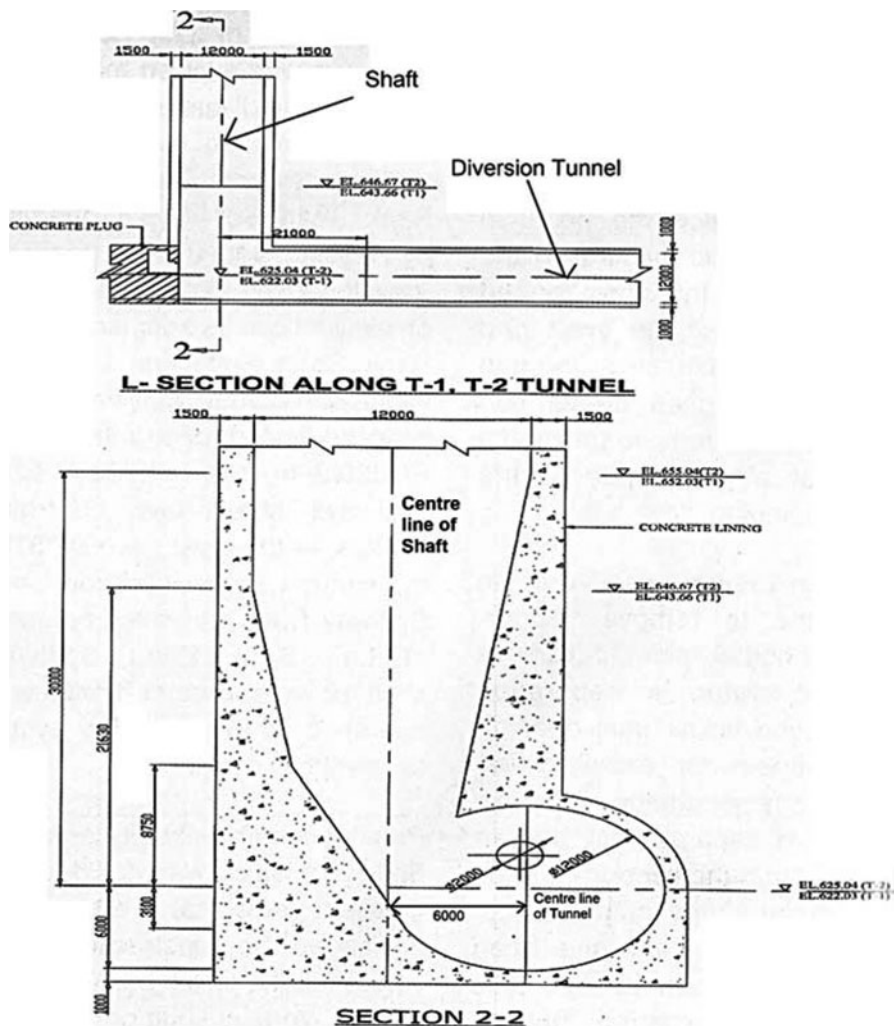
Swirling device connection of shaft and diversion tunnel.
